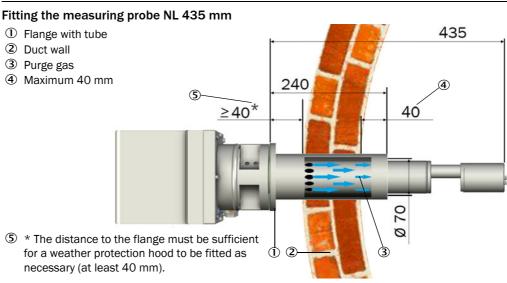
Fitting the flange with tube (all dimensions in mm) Shown (view from above) for high-temperature version, nominal length 435 mm
